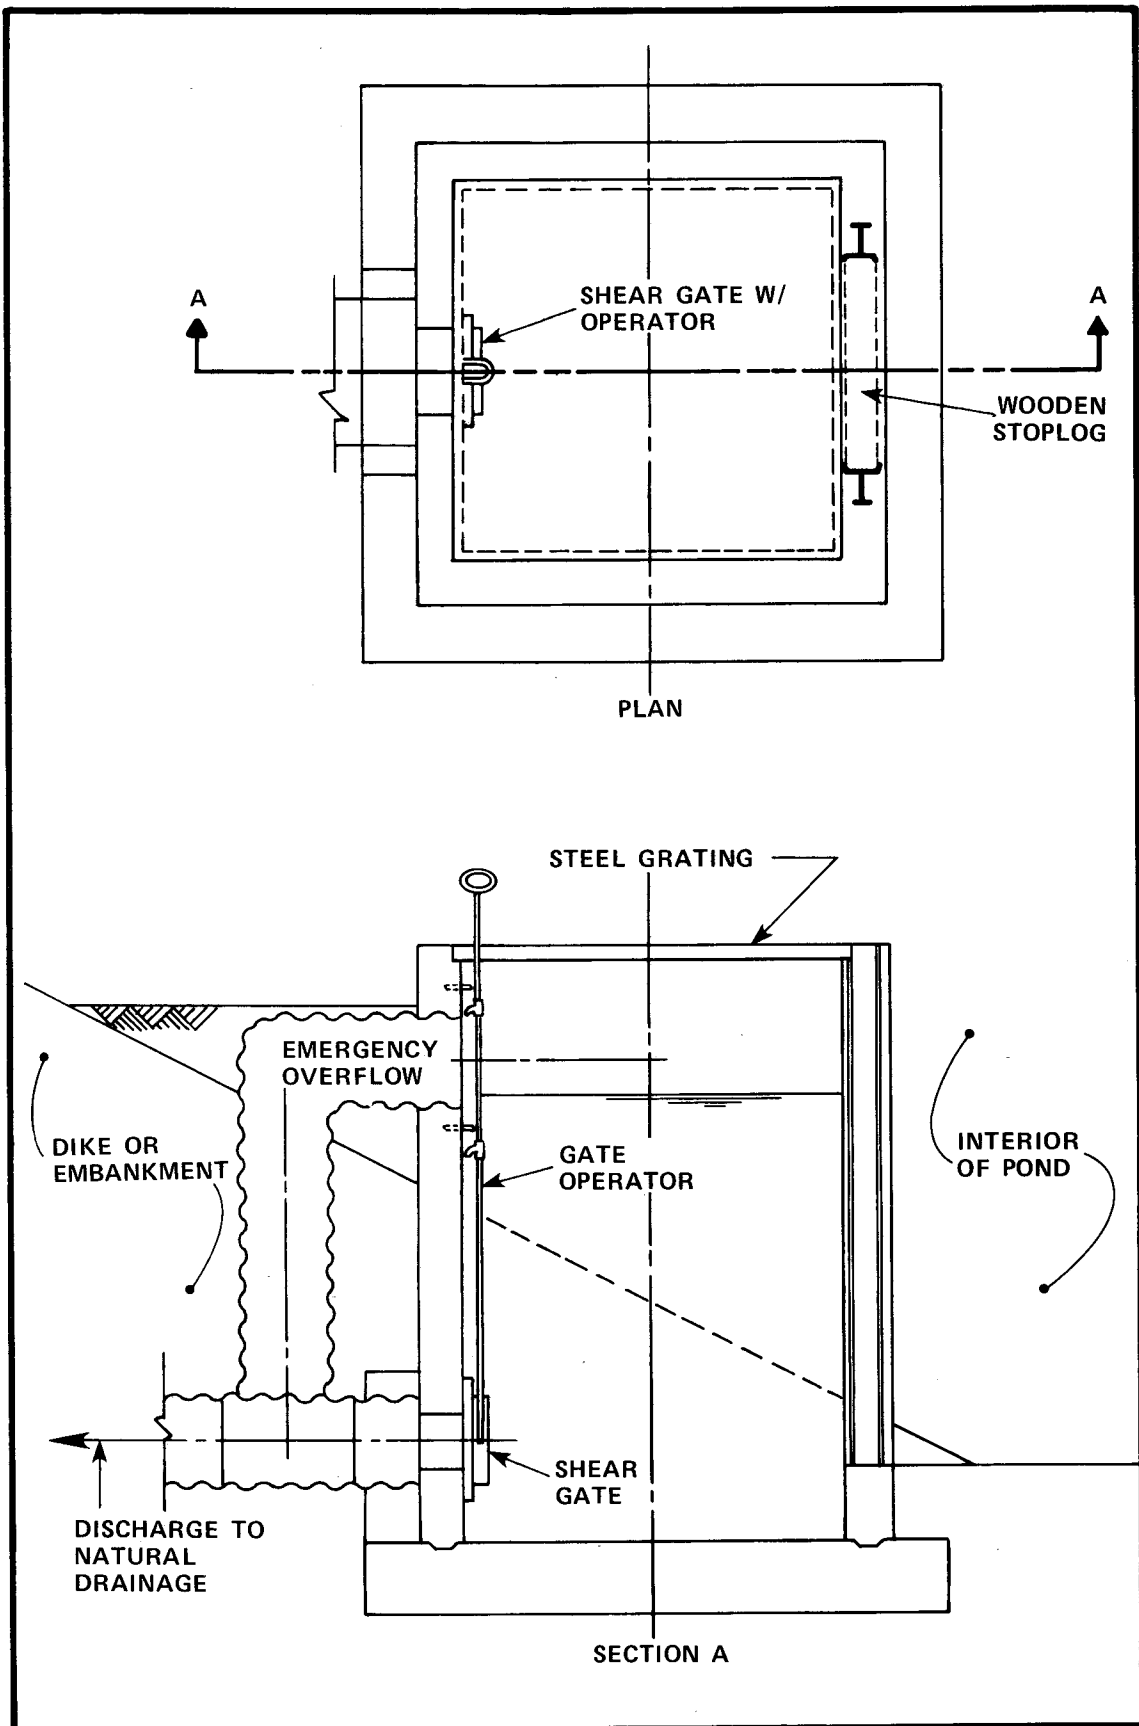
CONSTRUCTION RUNOFF POND OUTFALL STRUCTURE.
